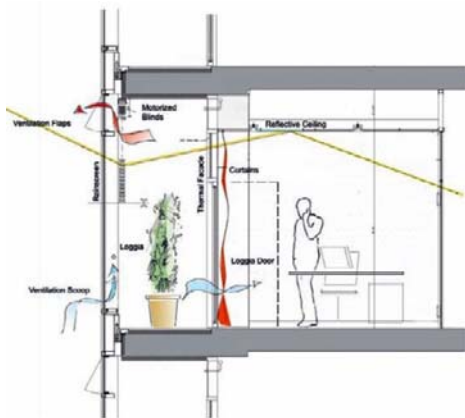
Section through the Genzyme Center in Cambridge, Massachusetts, illustrating the corridor facade configuration of a double skin façade [9]
